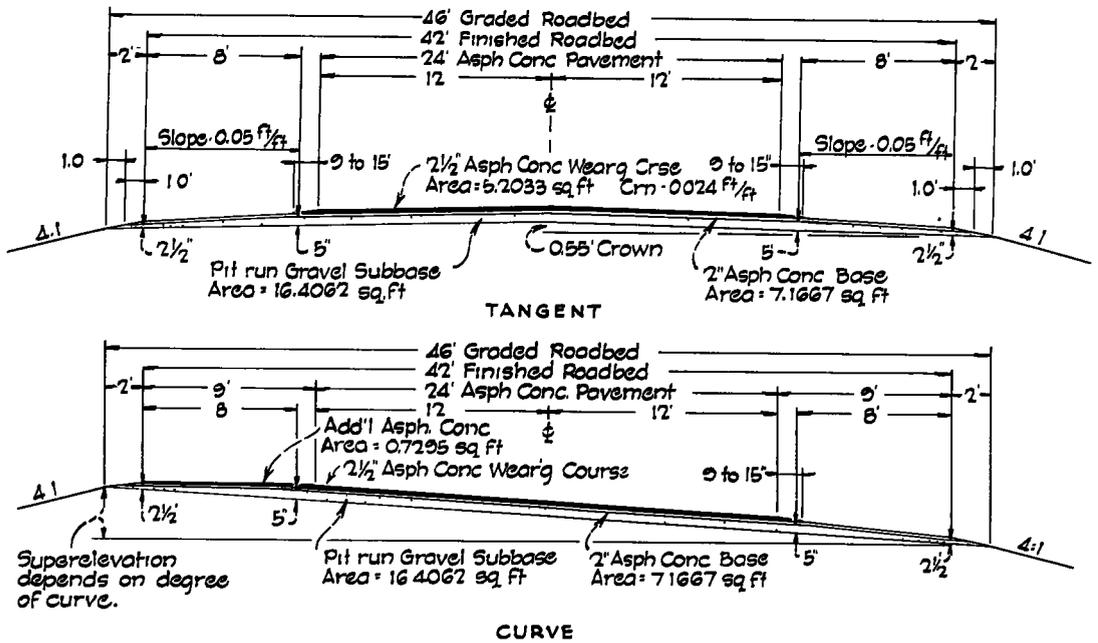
Typical flexible pavement sections, North Dakota State Highway Department.
